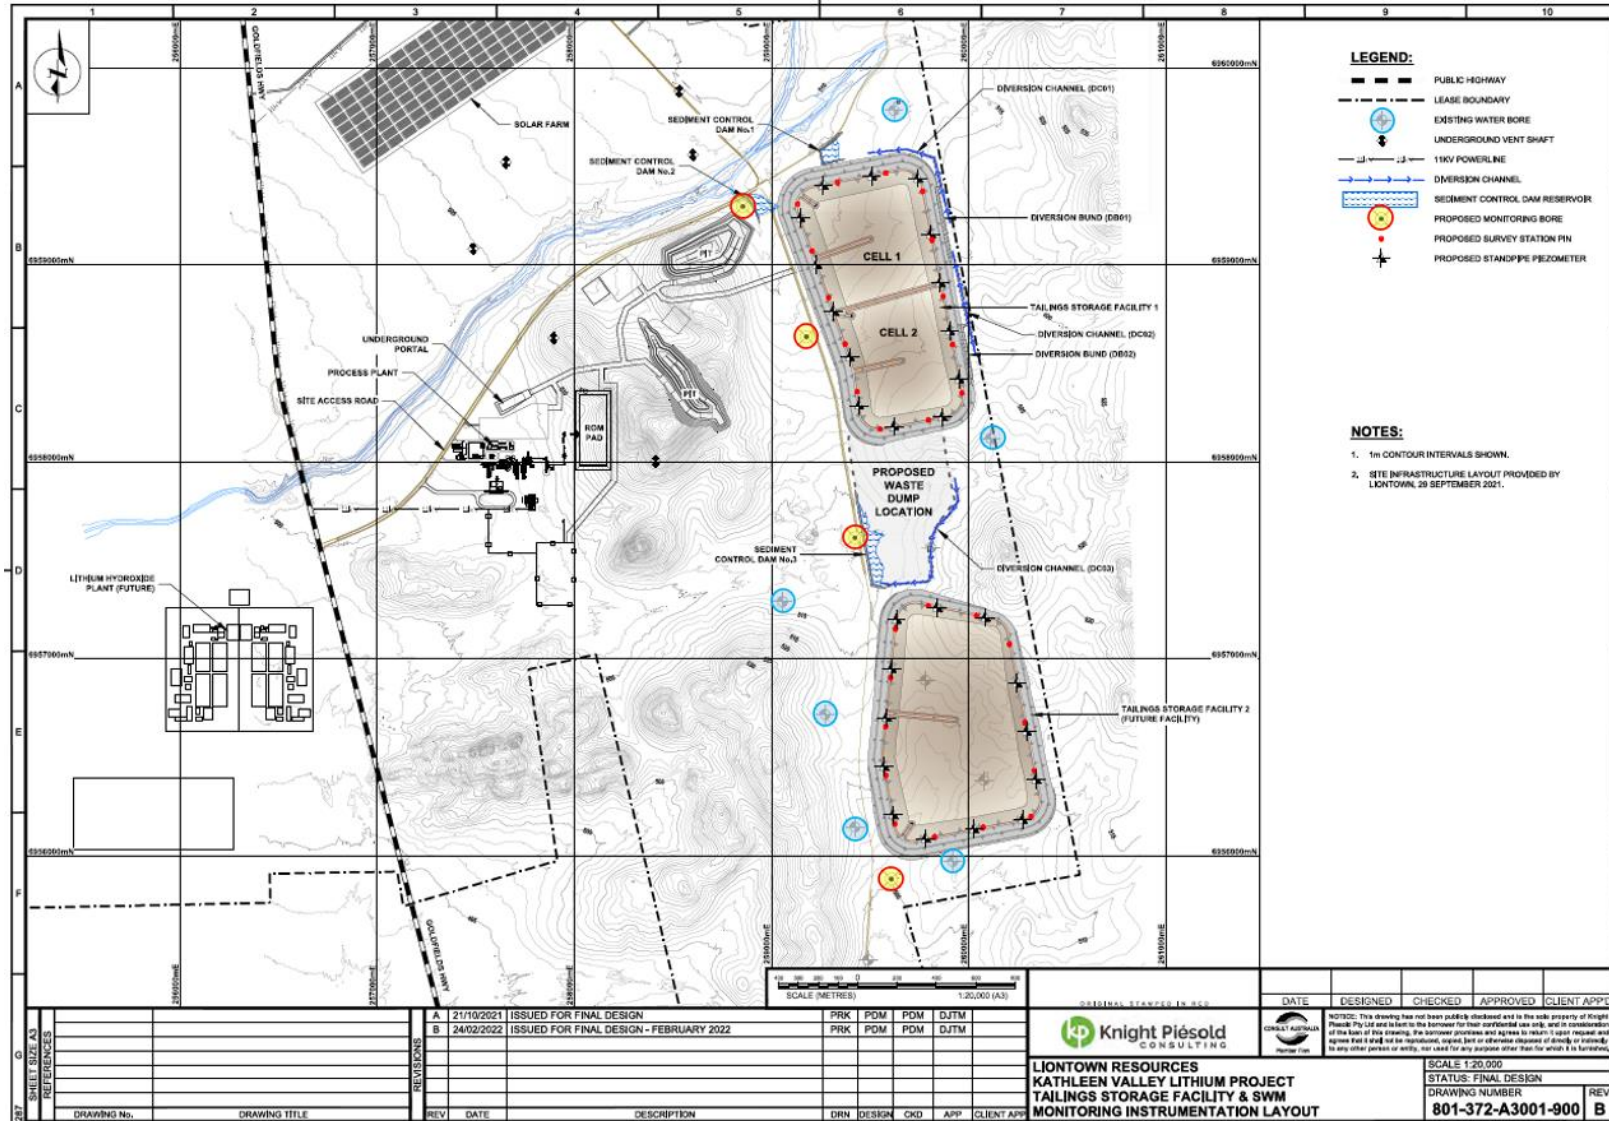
Tailings Storage Facility Monitoring Instrumentation Layout, TSF 1 only approved under W6687/2022/1 – 801-372-A3001-900
